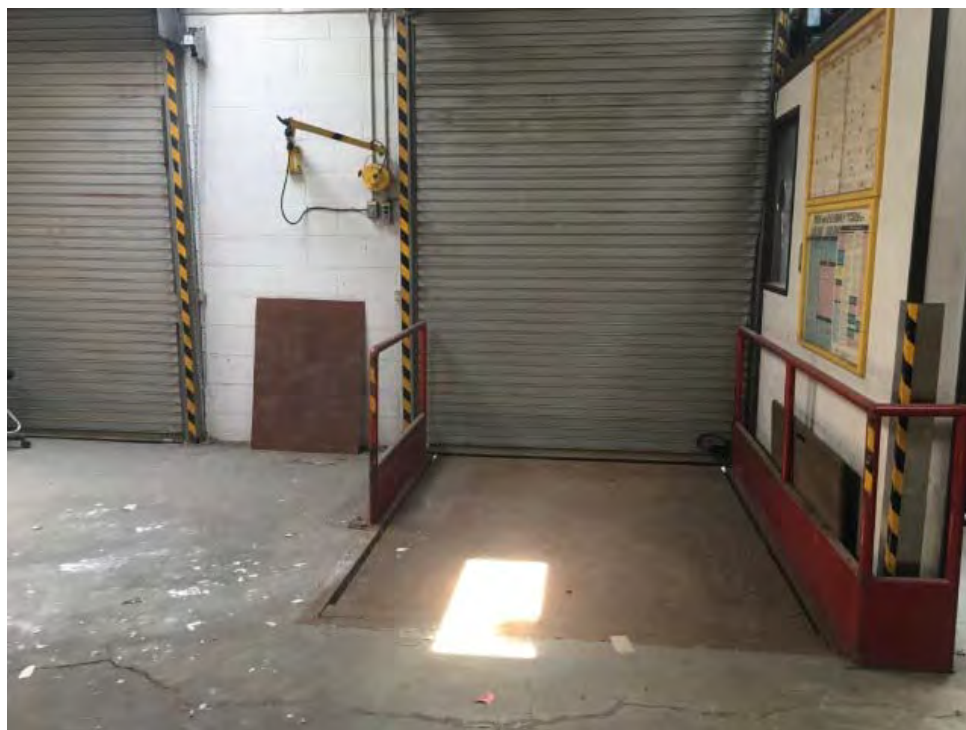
Loading dock with hydraulic lift on the northern portion of the building at 568 Booth Street.
